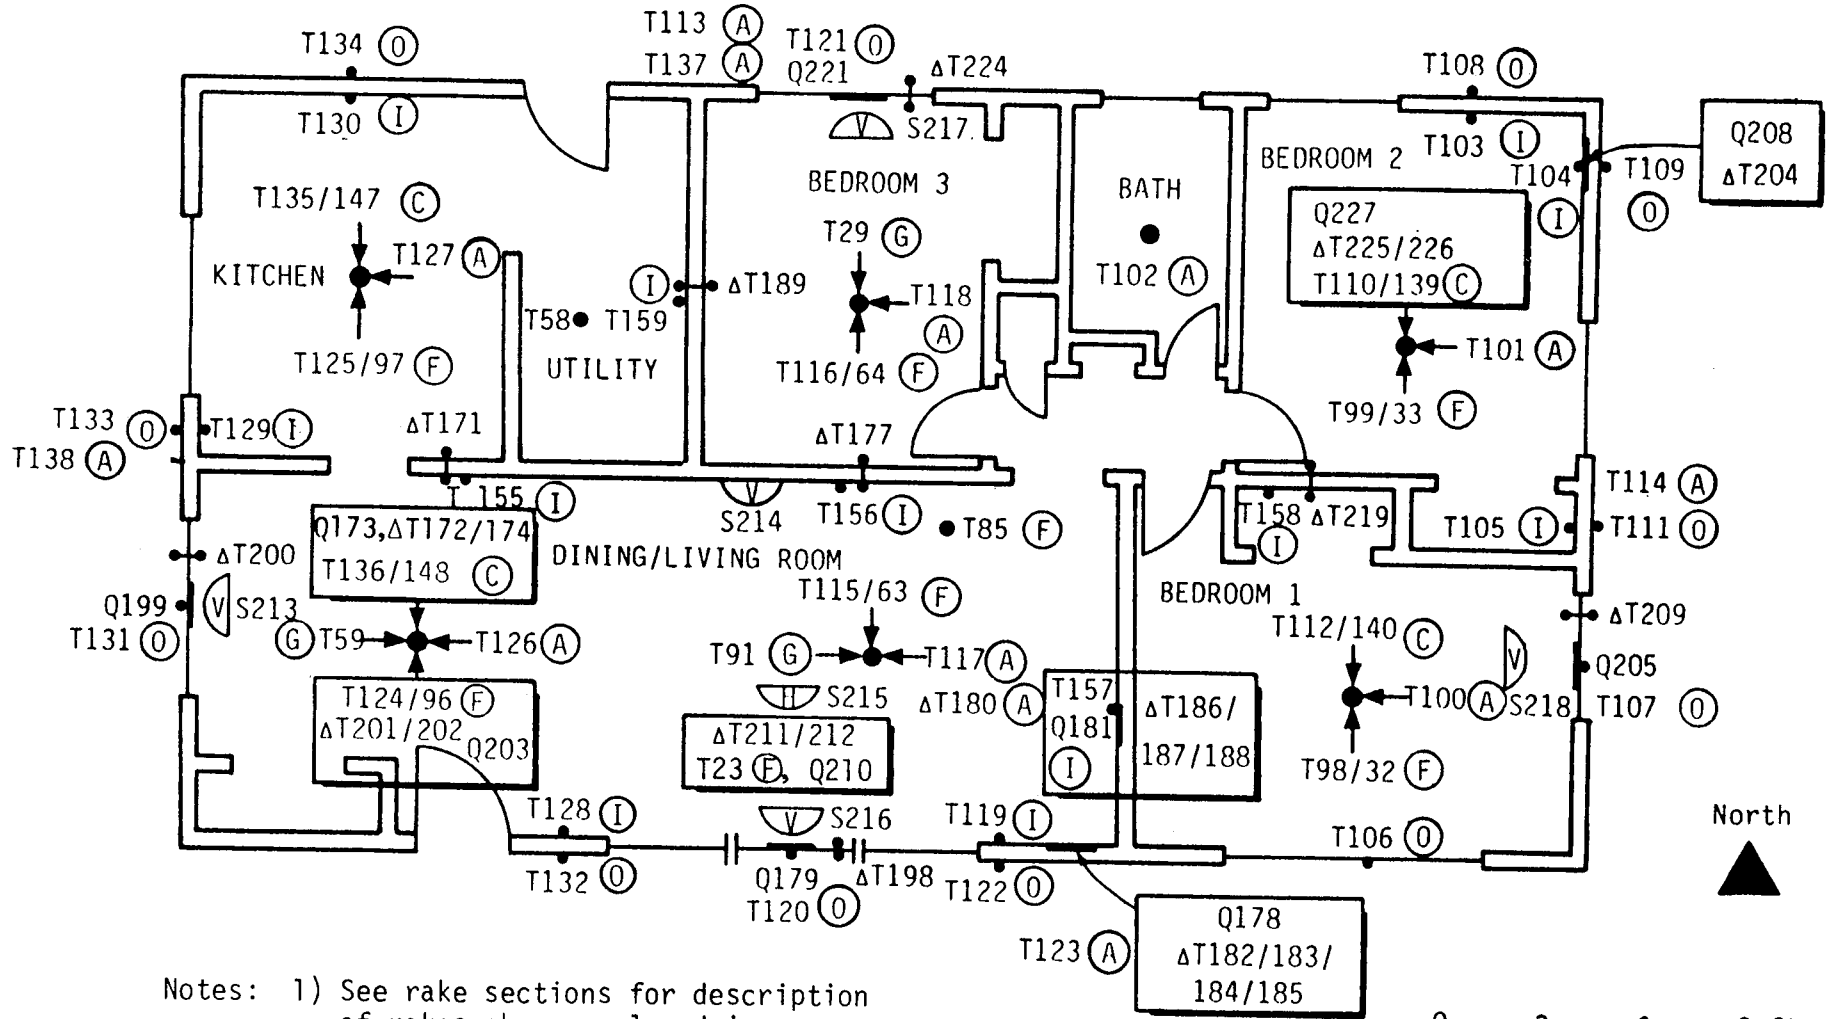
Sensor locations--floor, walls, and ceiling.
